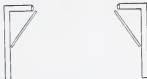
Floor plan showing position of doors half closed, equipped with "SlydaSyde" FF hardware.
